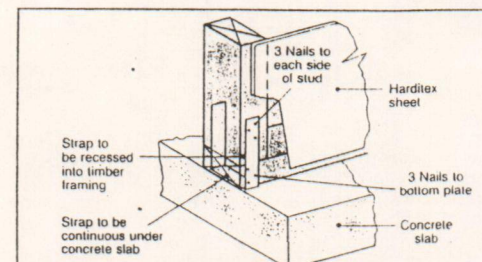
Harditex Special Fixing to Concrete Slab
